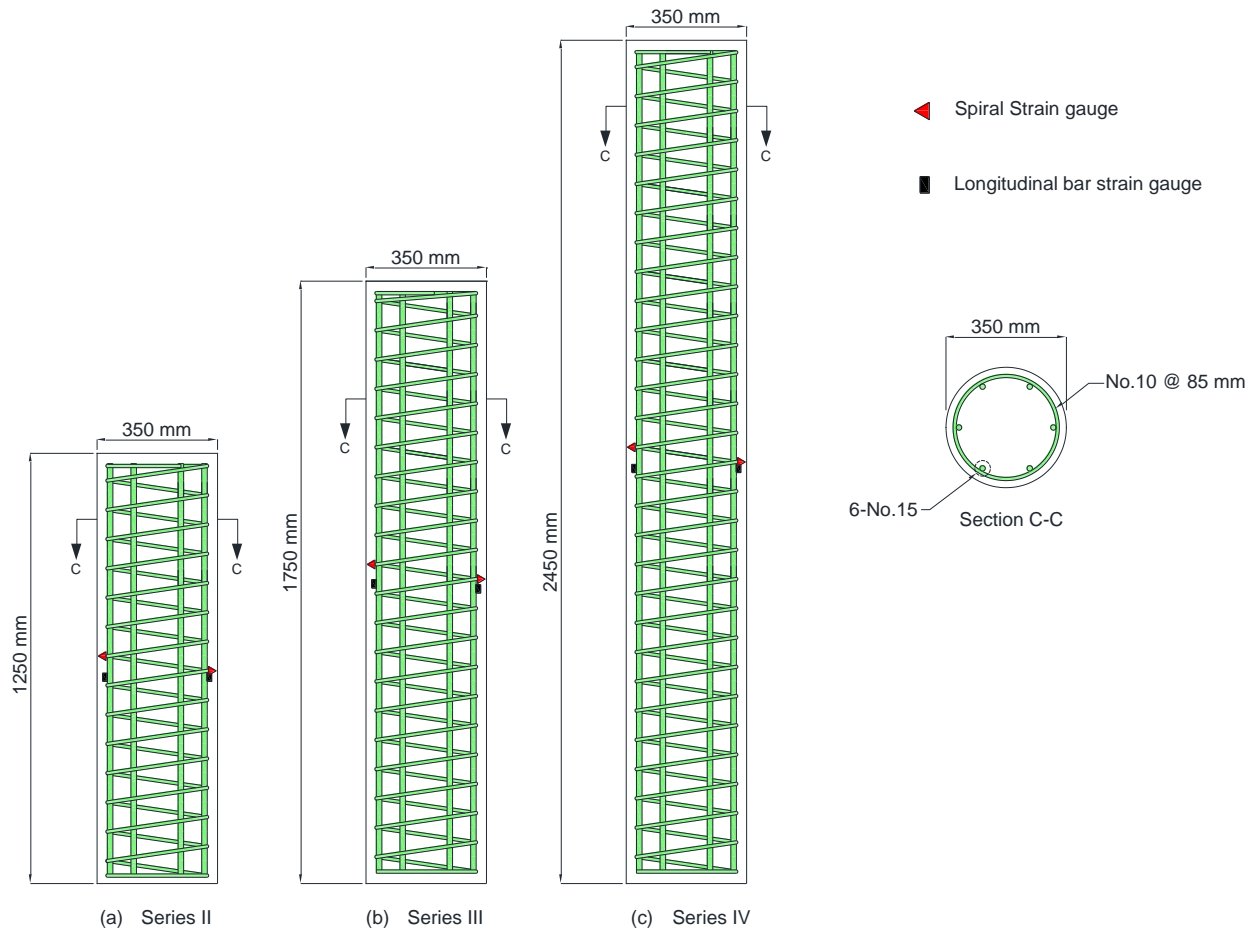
Reinforcement detailing for specimens of series II, III and IV
